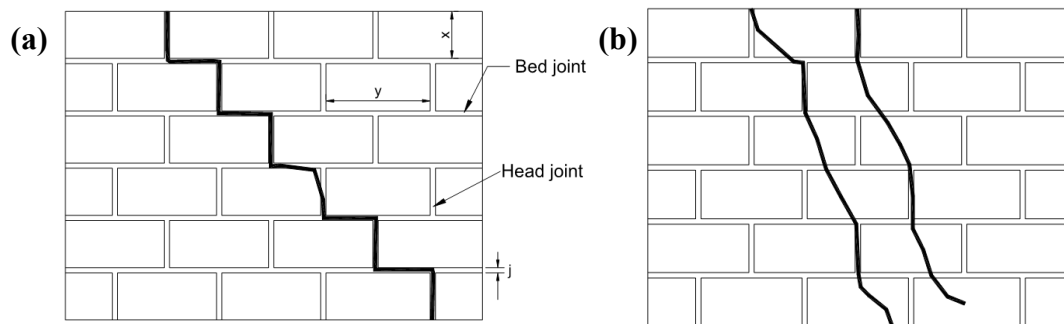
Diagonal shear mode of failure: (a) step cracking at low axial compressive stress; (b) diagonal cracking across masonry (adapted from Voon 2007)
